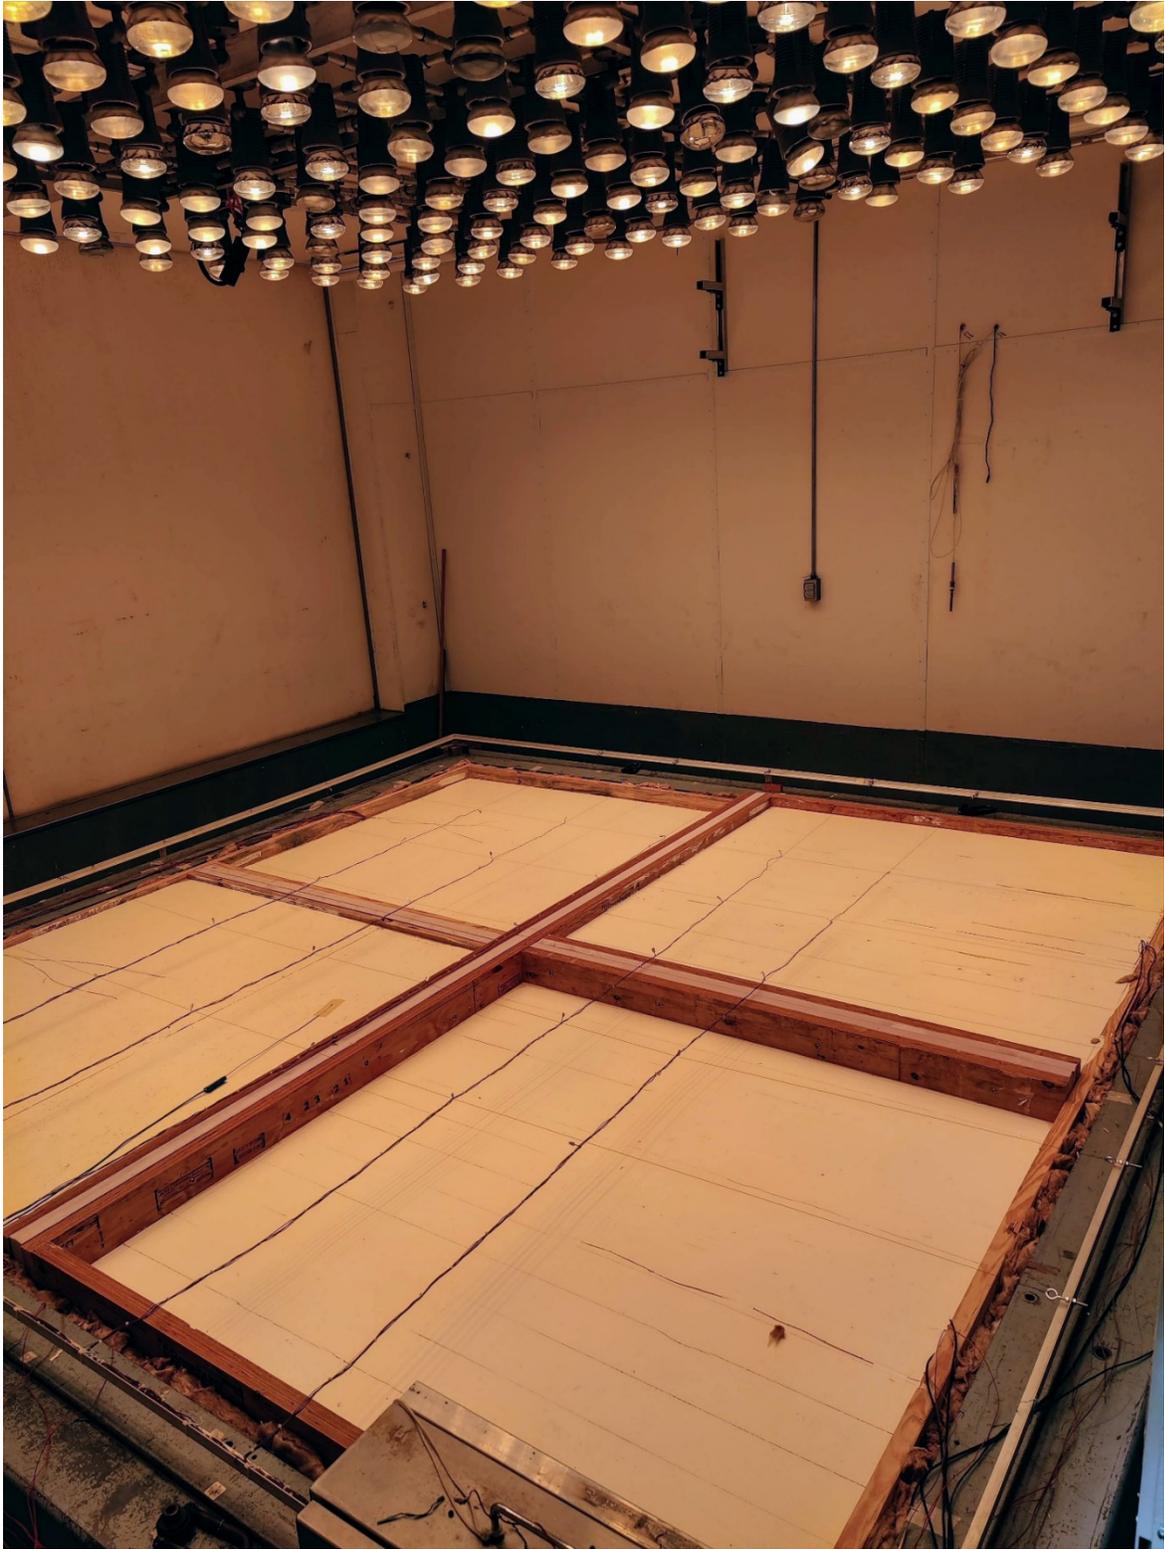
Wall assemblies installed in LSCS. Heat lamps are shown on top.
